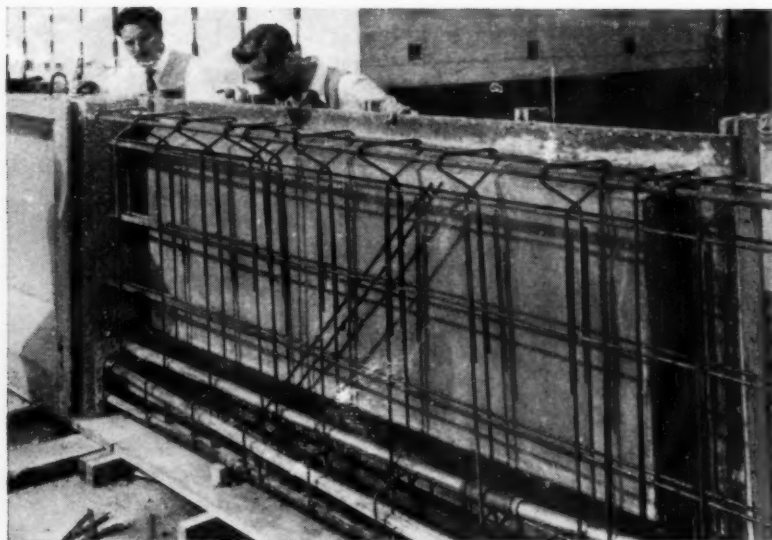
Mild Steel Reinforcement and Ducts for Prestressing Cables for Beam 54 ft. Long.
